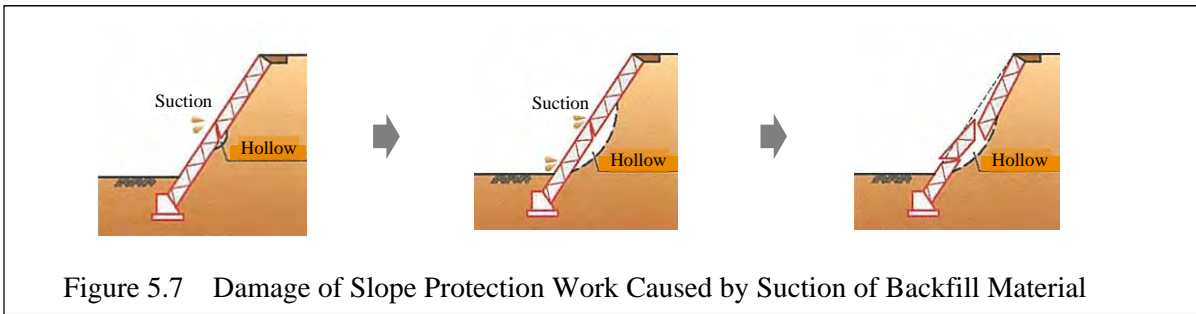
Damage of Slope Protection Work Caused by Suction of Backfill Material
